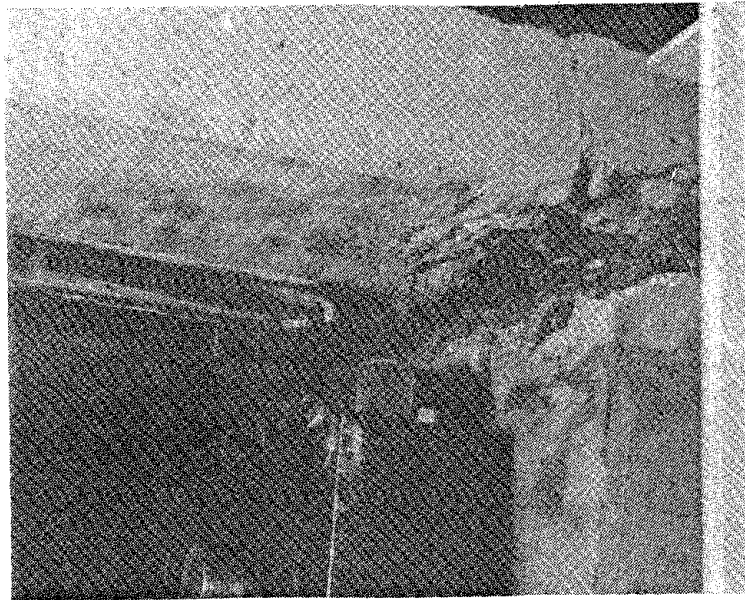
Separation of the Beam from the Slab Near the Free End of the Beam - Specimen 8.
